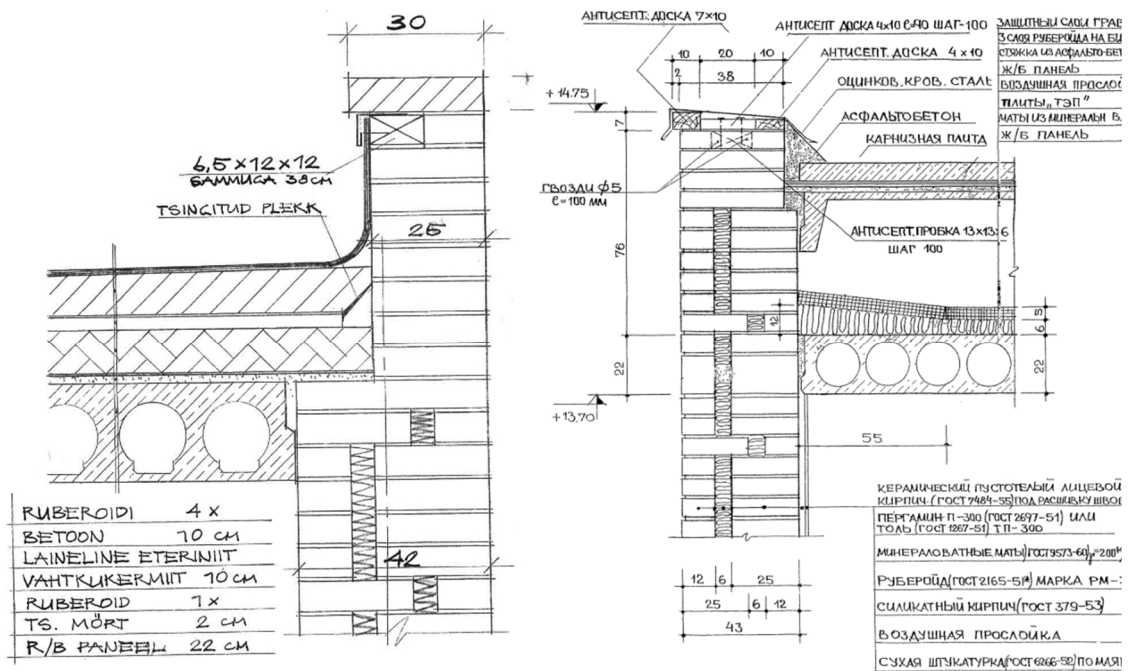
Connection of the external wall and roof of studied brick apartment buildings.
